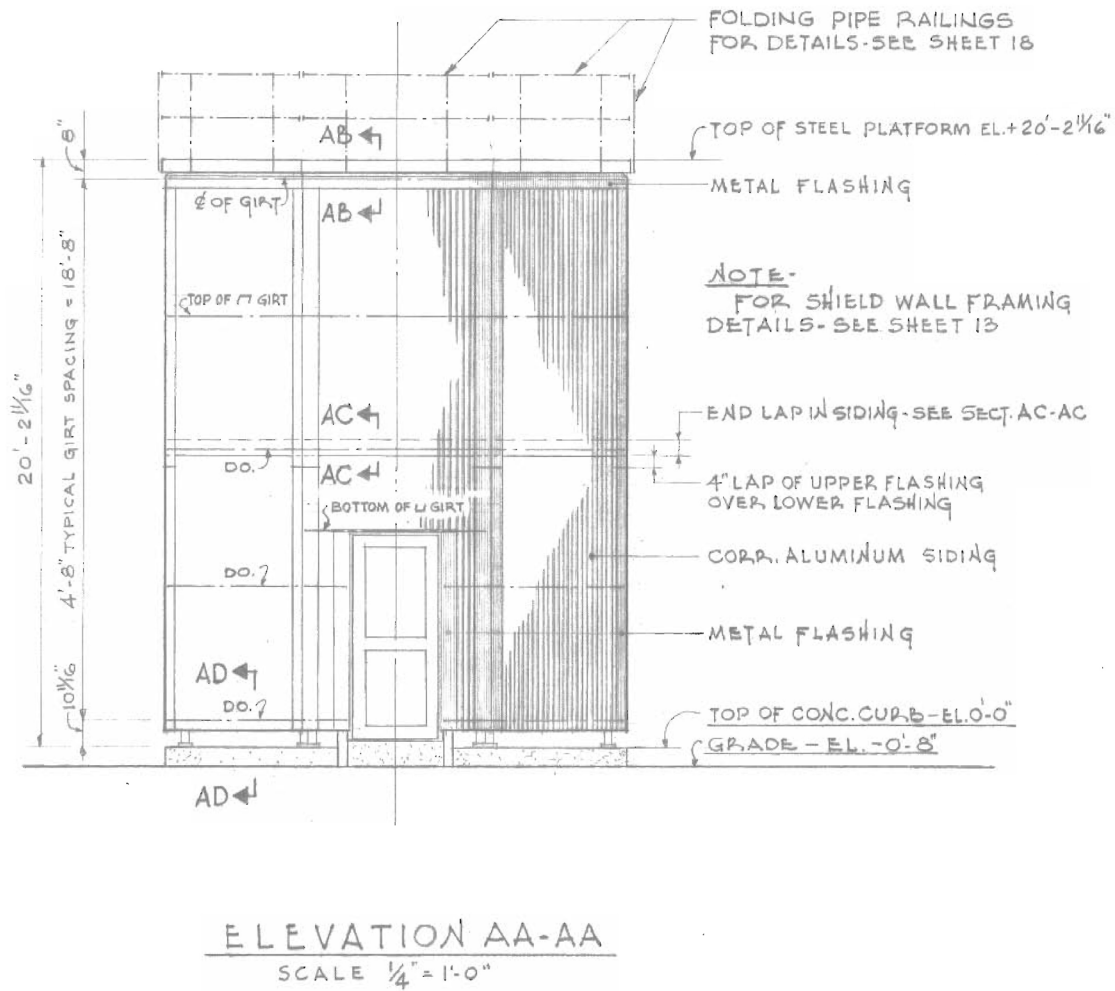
Elevation view of MTR antenna tower from 1959 WS-JO plans.
